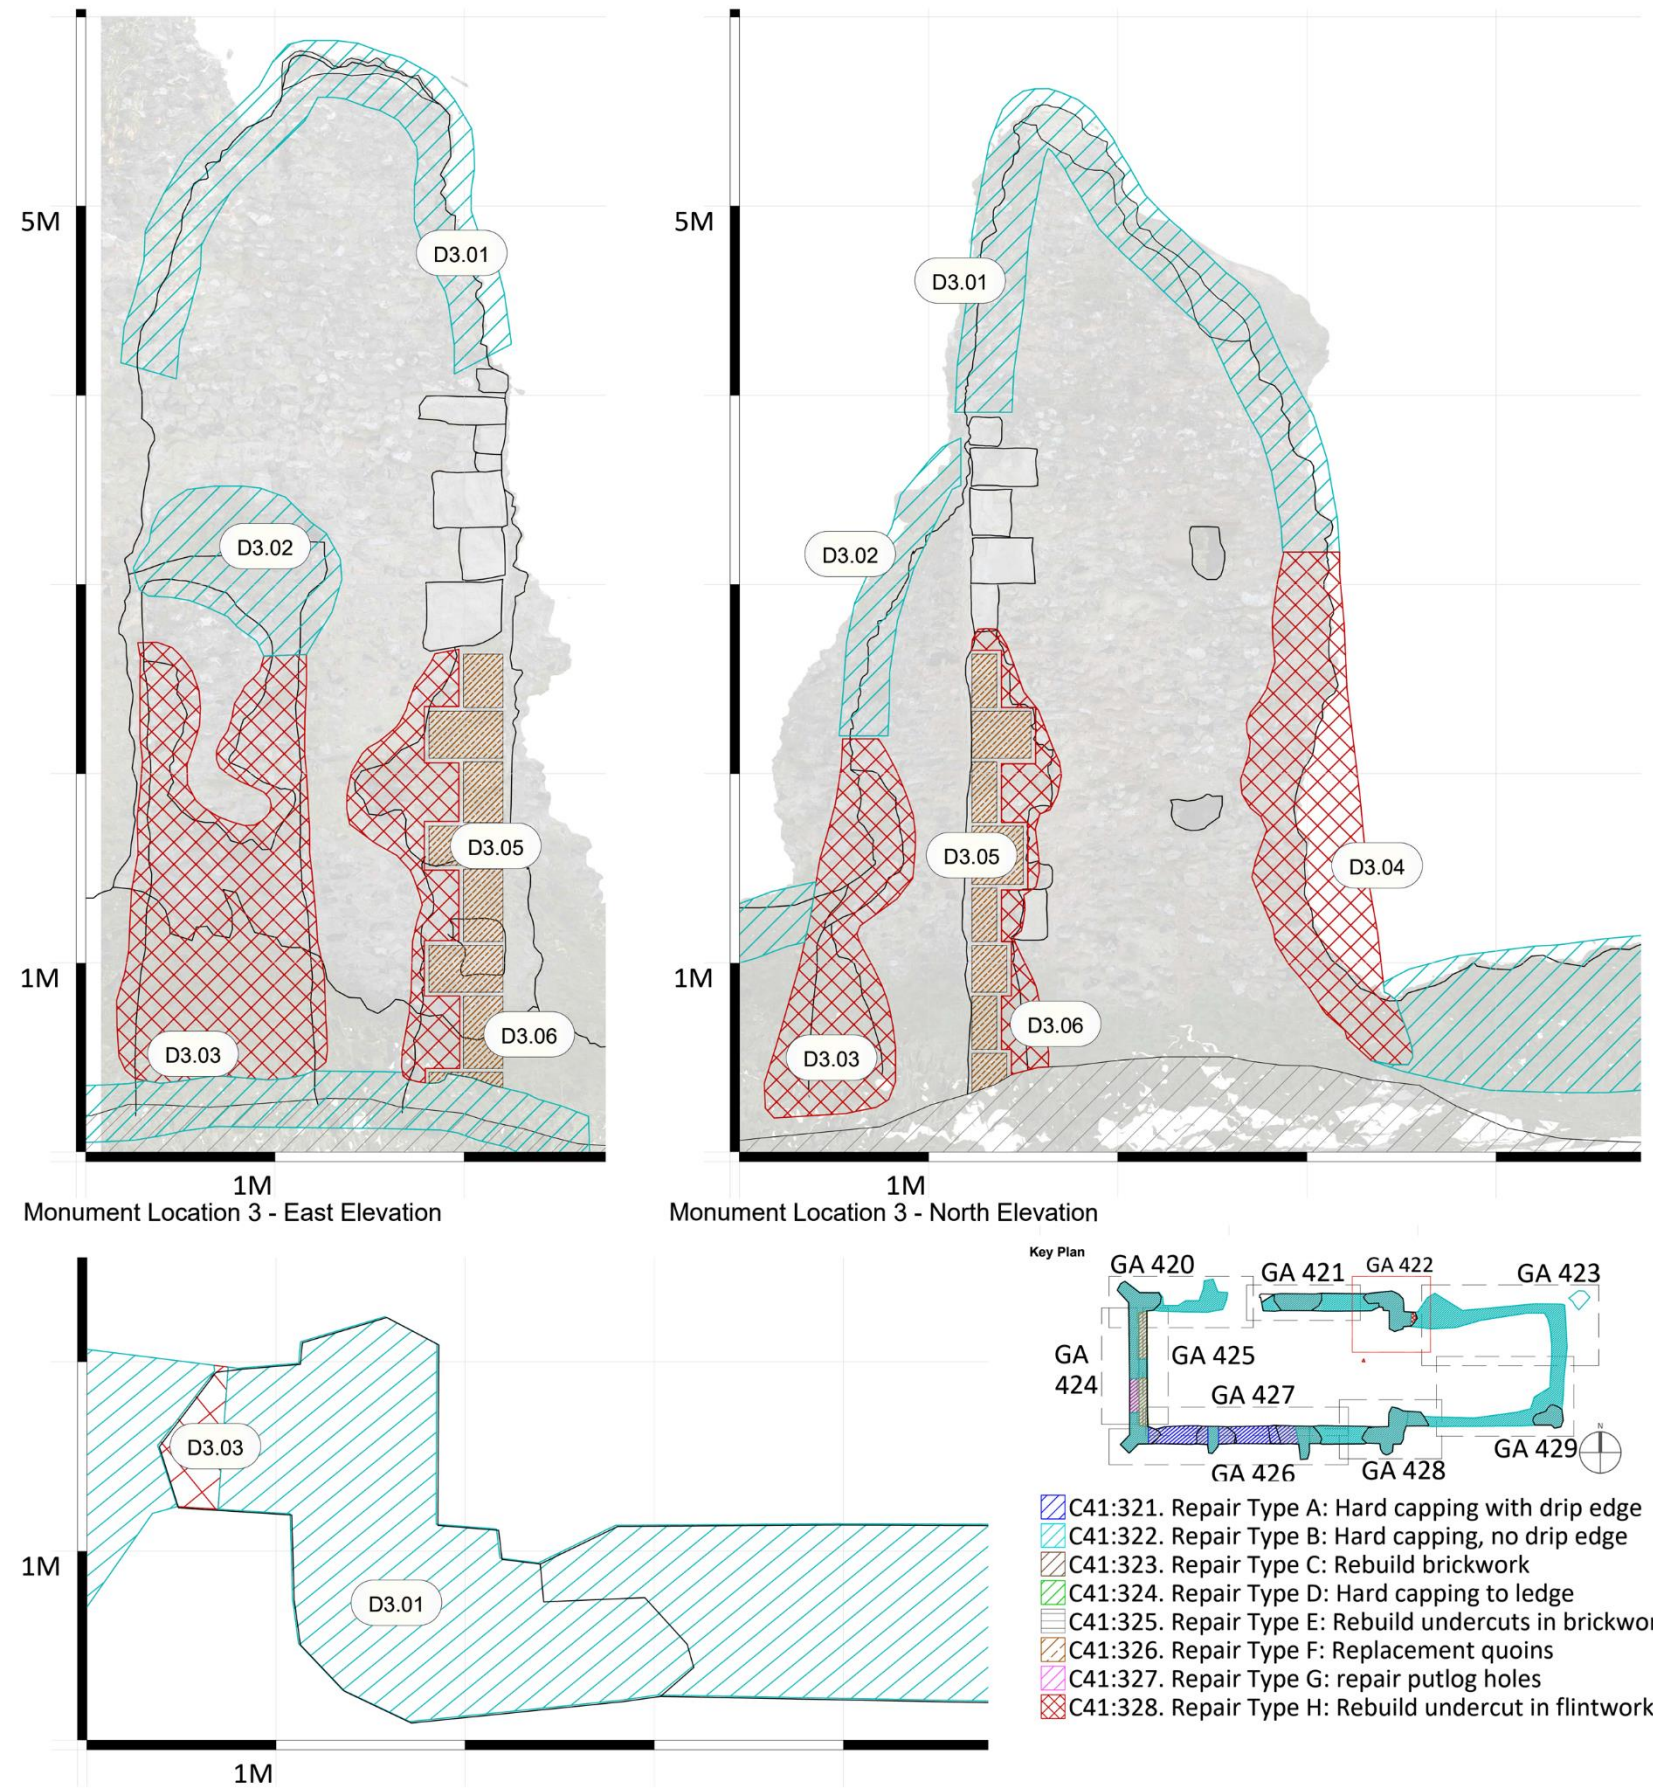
Works undertaken to the northeast nave corner (scale 1:40)
